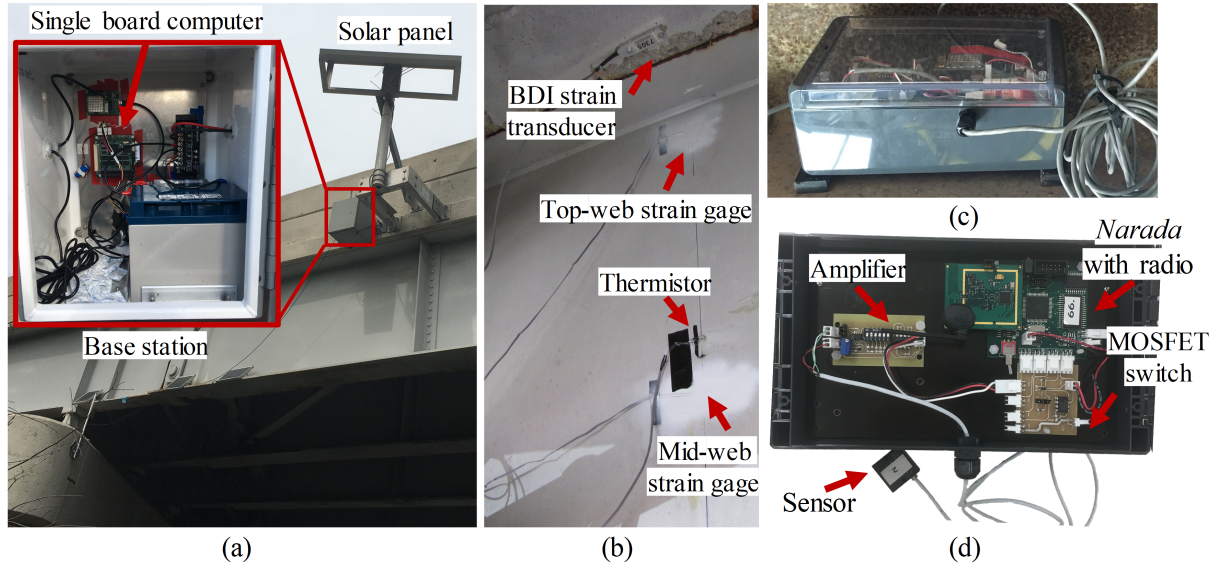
Highlights of Telegraph Road Bridge instrumentation: (a) base station with solar panel used for power; (b) installation of strain sensors (BDI strain transducer on slab and metal foil gauges on girders); (c) wireless sensor enclosure for strain gauge data collection magnetically mounted to steel girder flange; (d) internal components of wireless sensor node.
